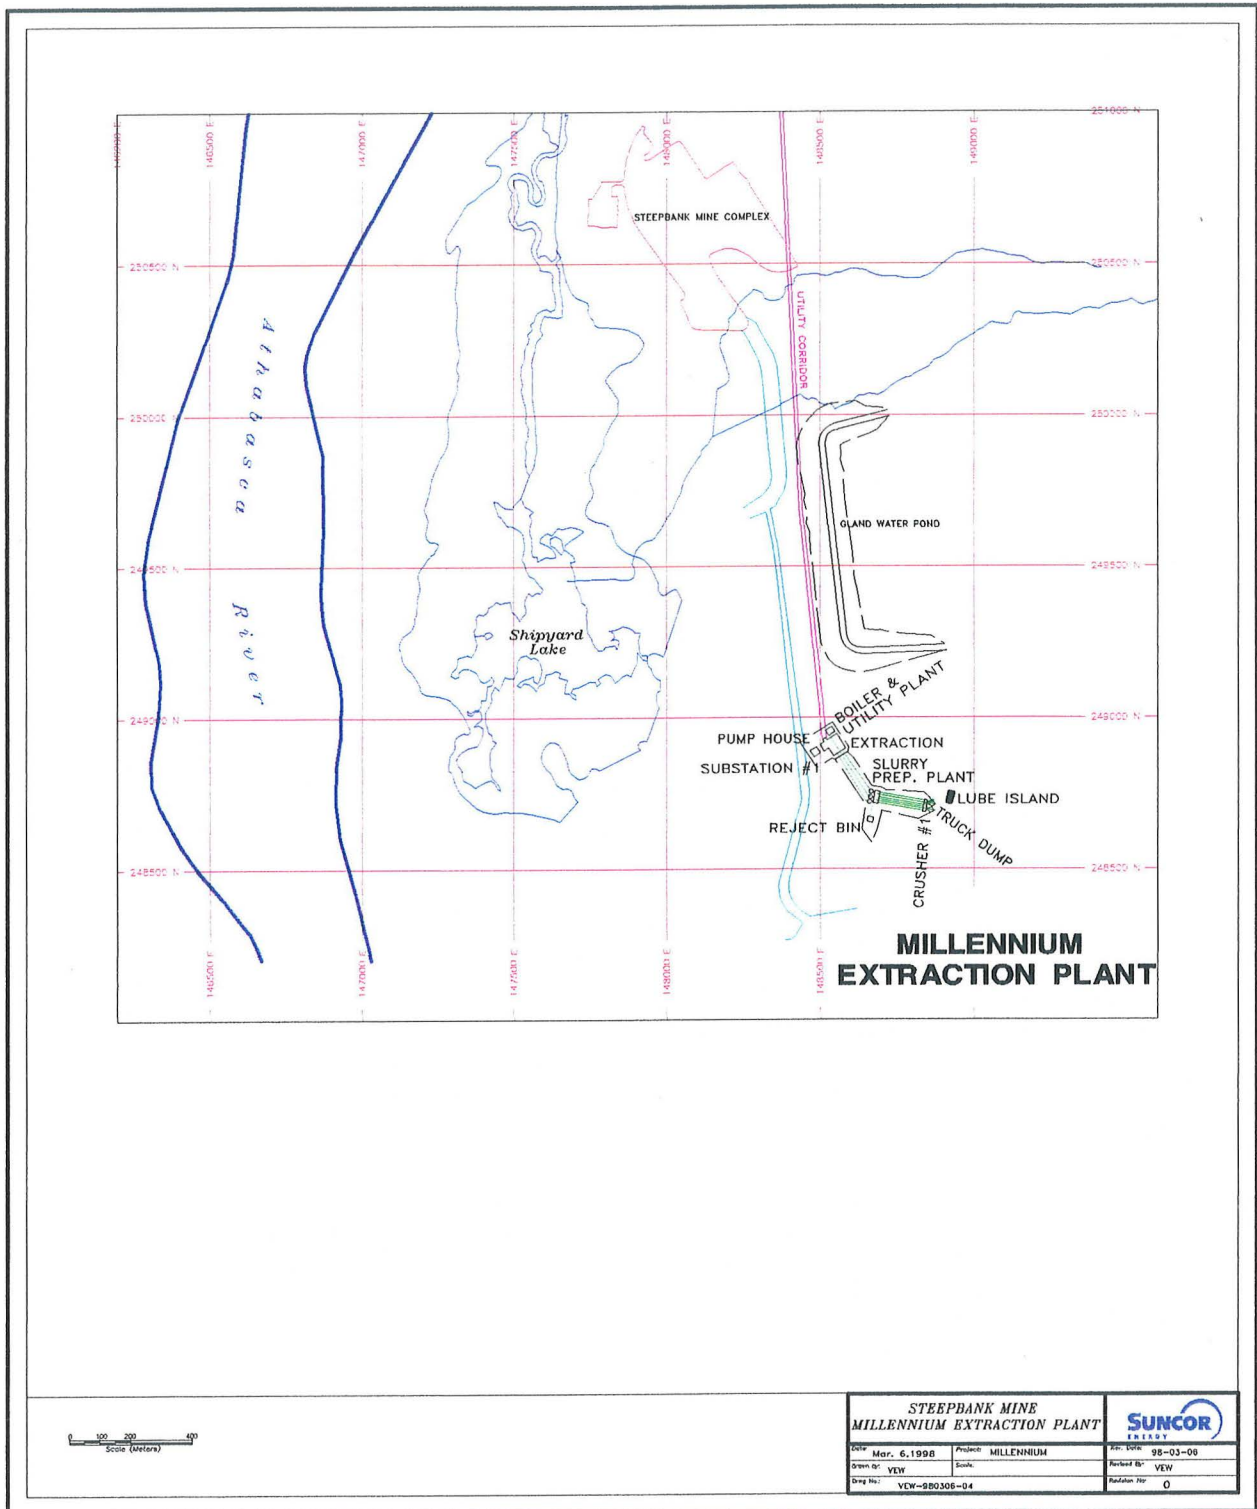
Millennium Facility Layout and Utility Corridor
